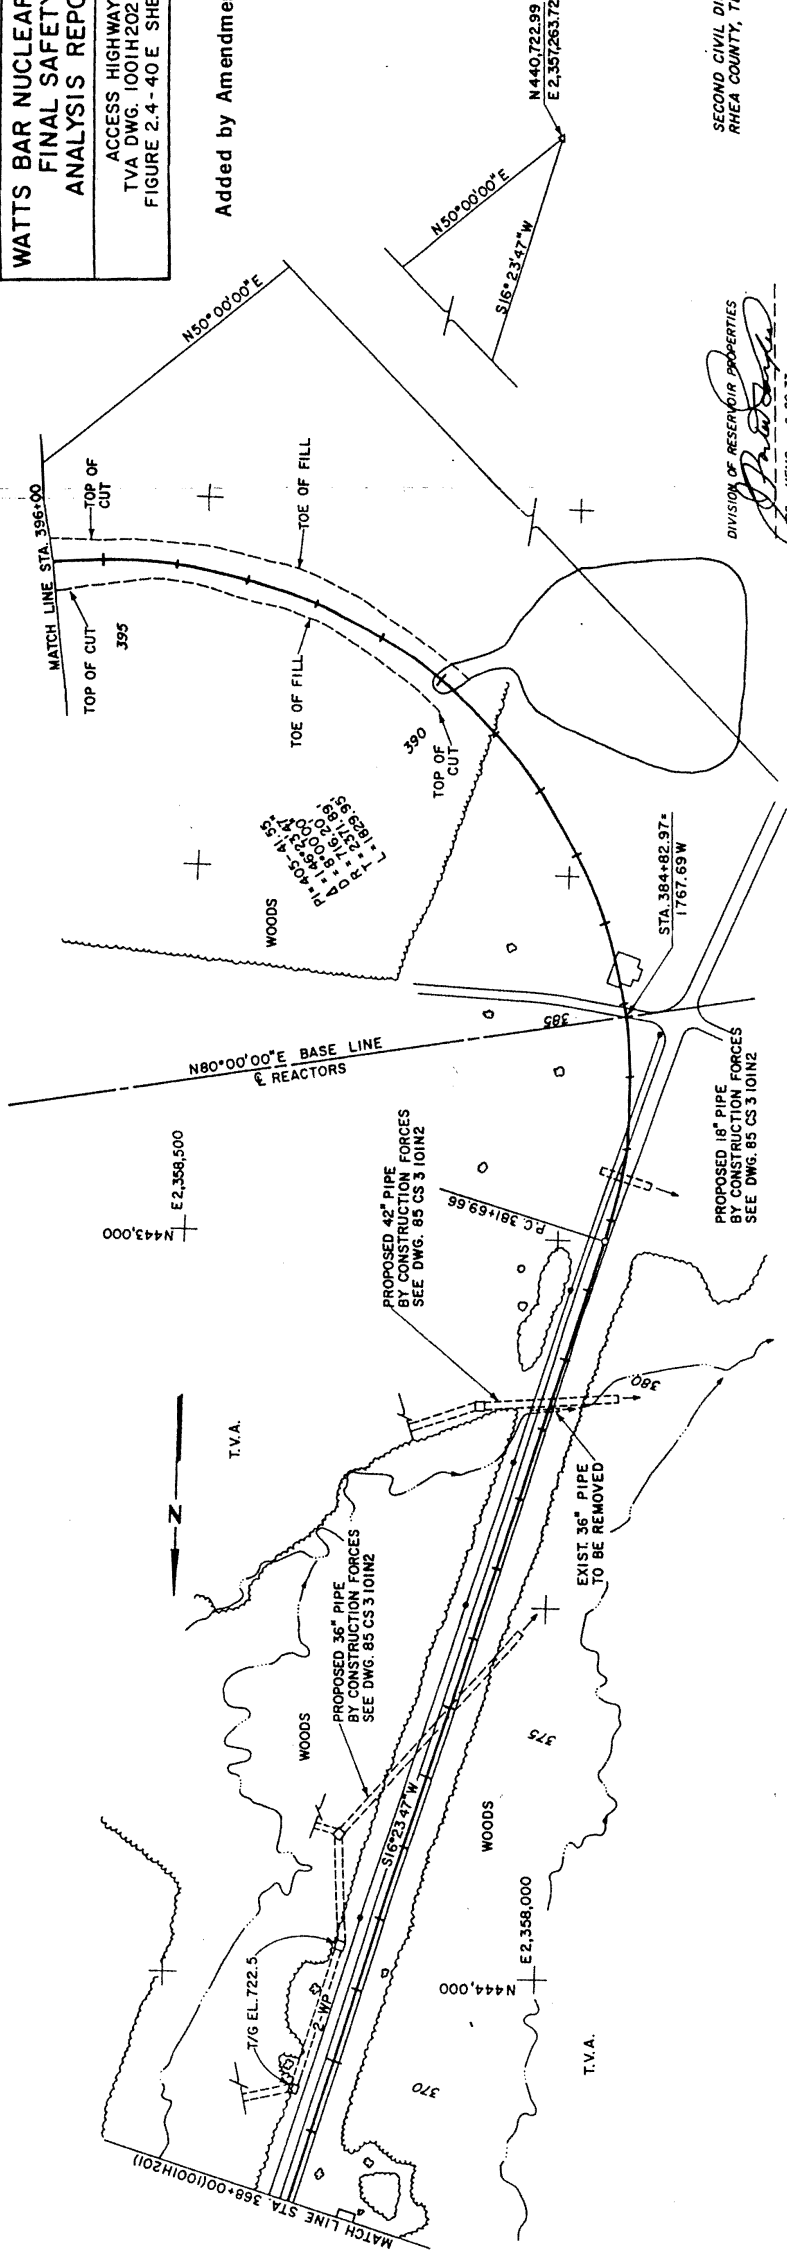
Main Plant Perimeter Roads Plan and Profile - Sheet 3
